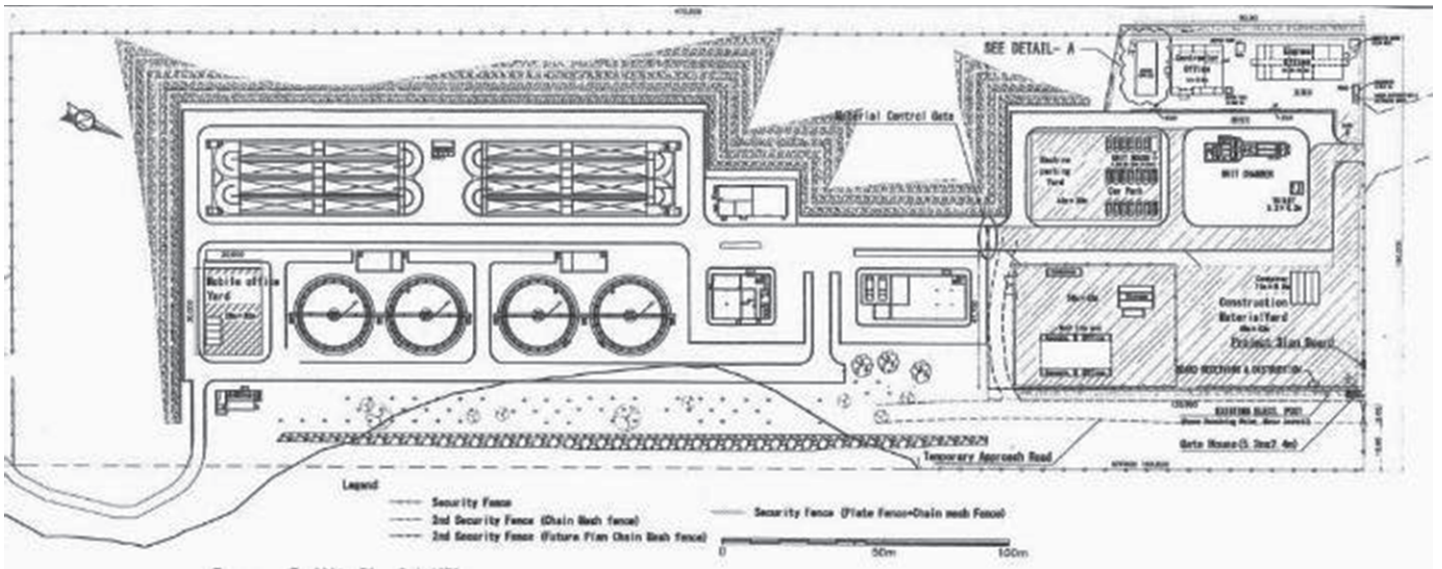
Layout of the Sewage Treatment Plant (STP)
